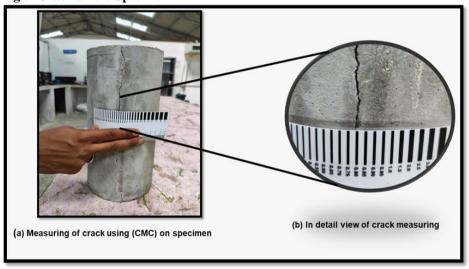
(a, b) Measuring of Crack on the Specimen using "Crack Measuring Card" (CMC)
